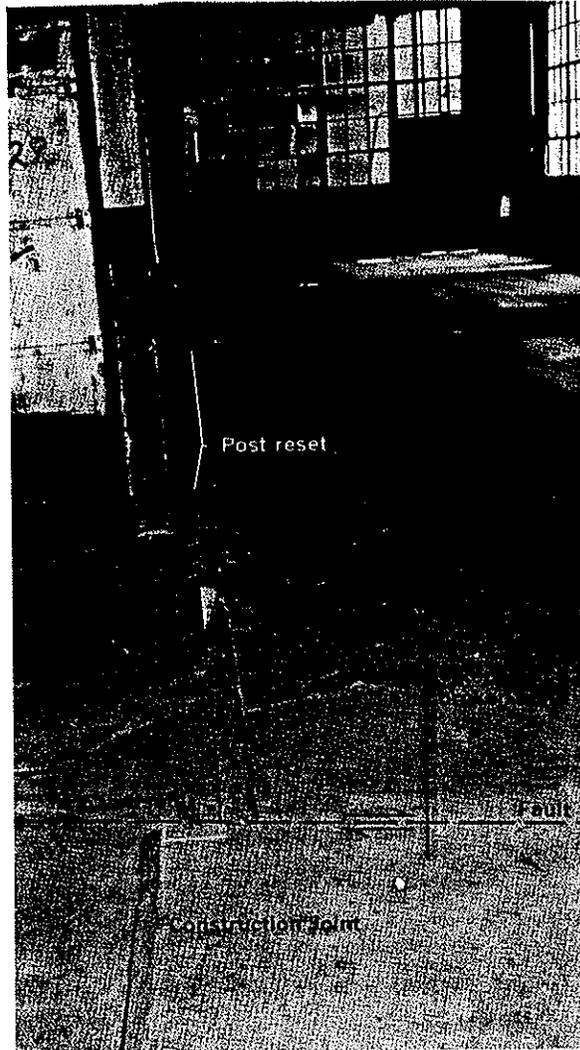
View looking northeast and almost perpendicular to strike of fault inside building straddling fault. Construction joint in floor slab has been displaced approximately 6 inches right laterally.
